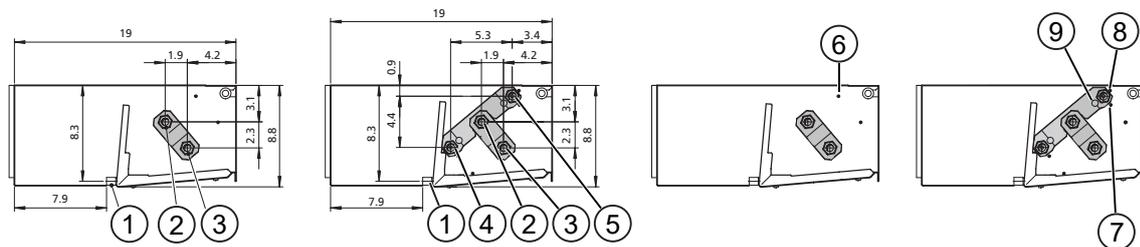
Ceiling-mounted basic unit, 2-pipe and 4-pipe
